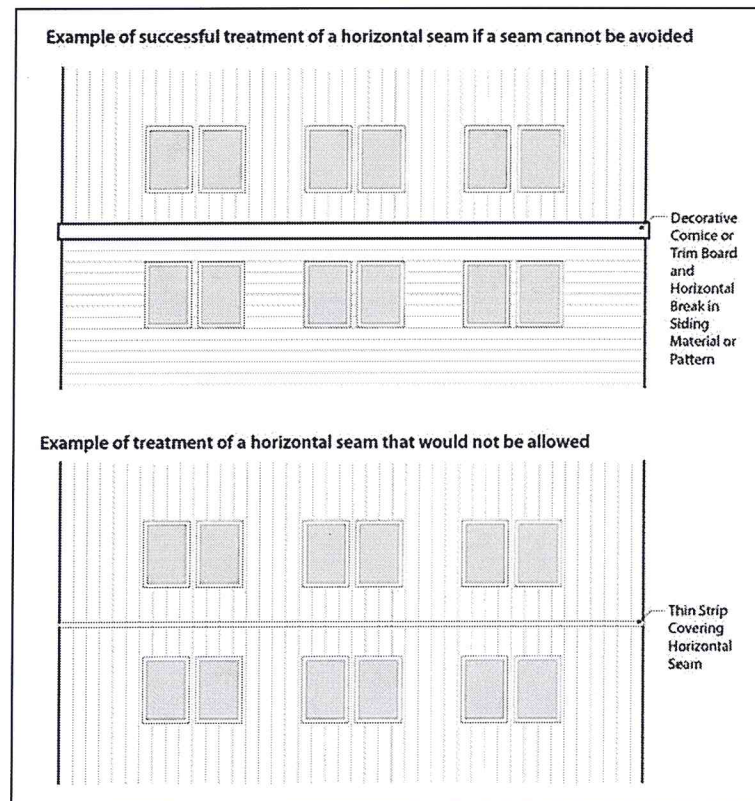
Exterior Walls – Horizontal Seam Treatment
